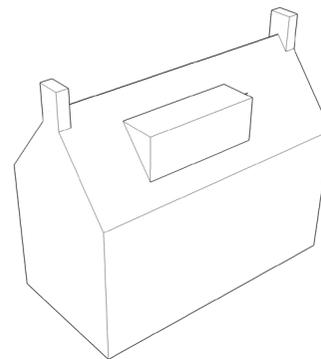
H: Large flat roofed single dormer out of scale with the original dwelling
